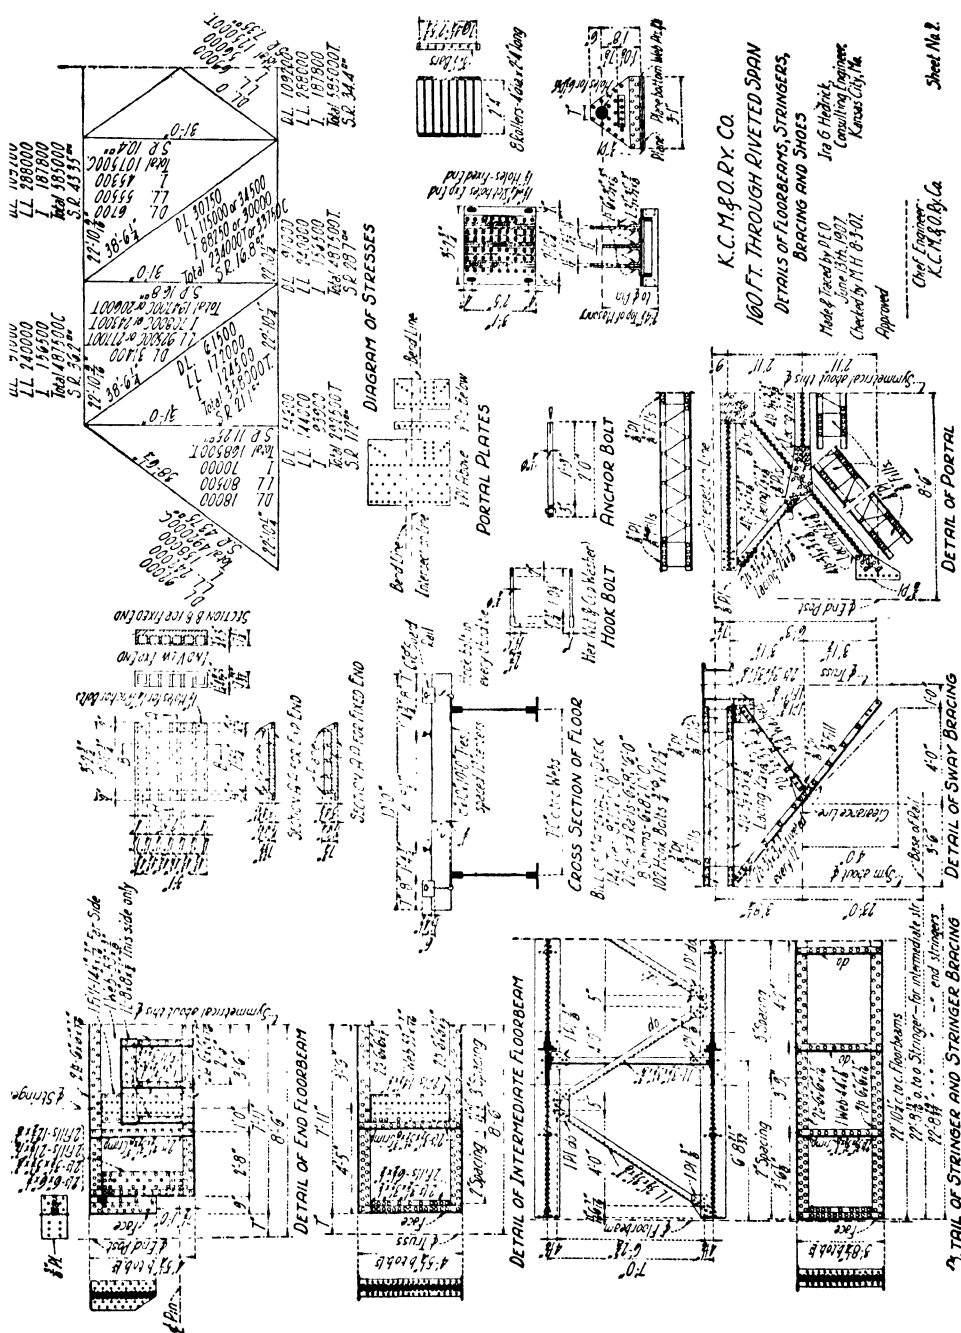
SINGLE 'TRACK 'THROUGH RIVETED TRUSS RAILWAY BRIDGE.
